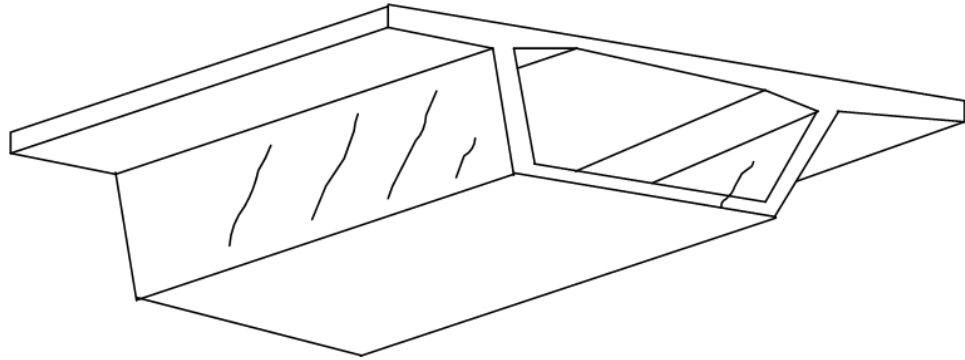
Box Girder Cracks Induced by Shear
